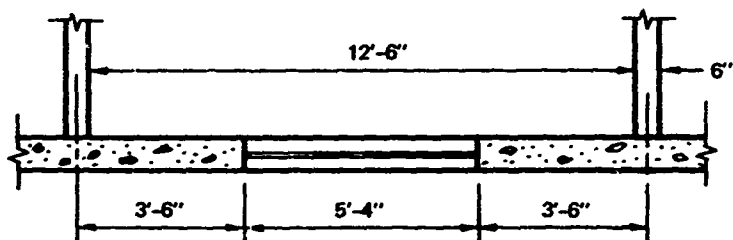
FIRST FLOOR PLAN VIEW OF
